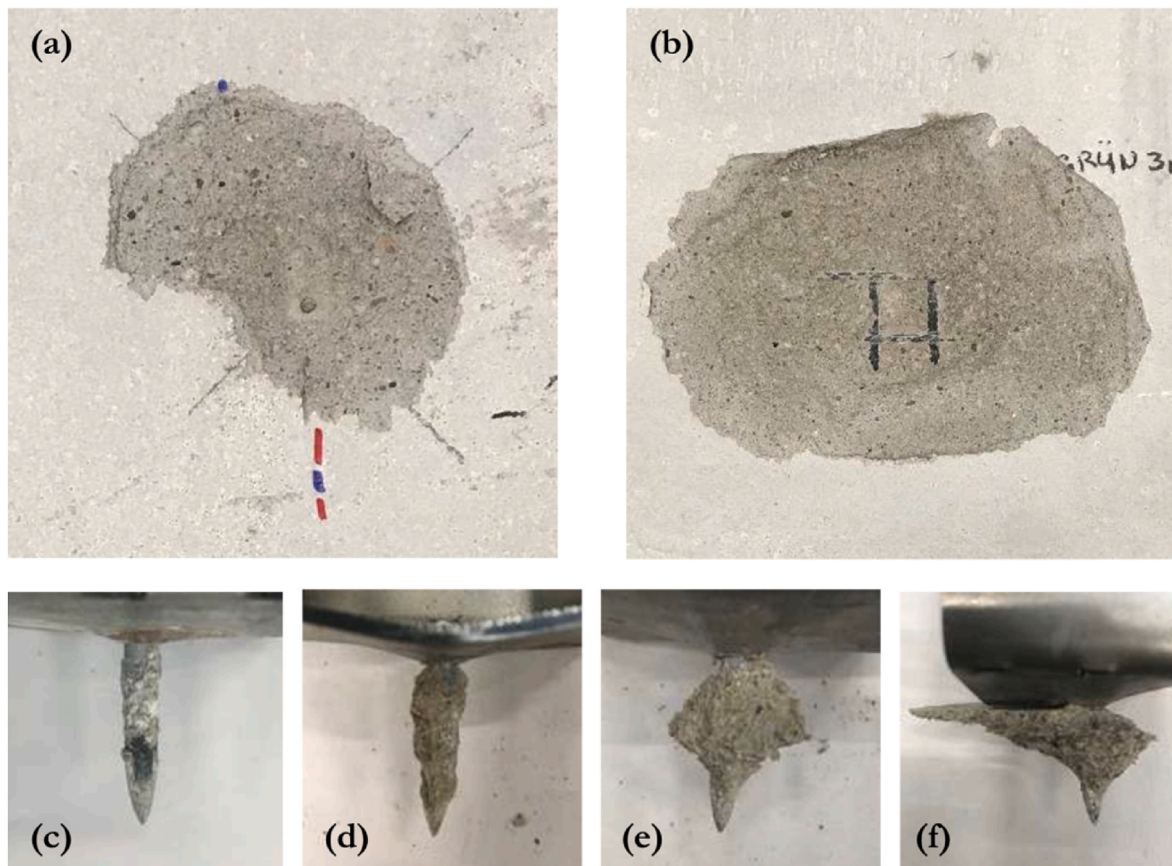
Representative failure images: breakout failure as viewed on the panel fastening side (top); failure body type as viewed on the extracted nail (bottom).
